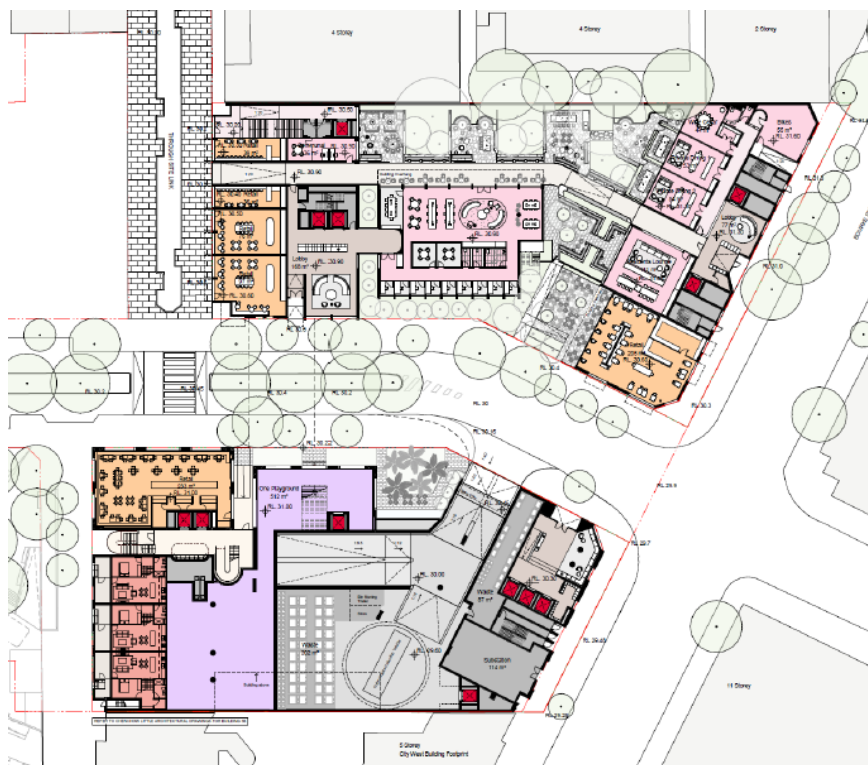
Parcels 2 and 3 ground floor plan. Source: Bates Smart & Chenchow Little 2025
